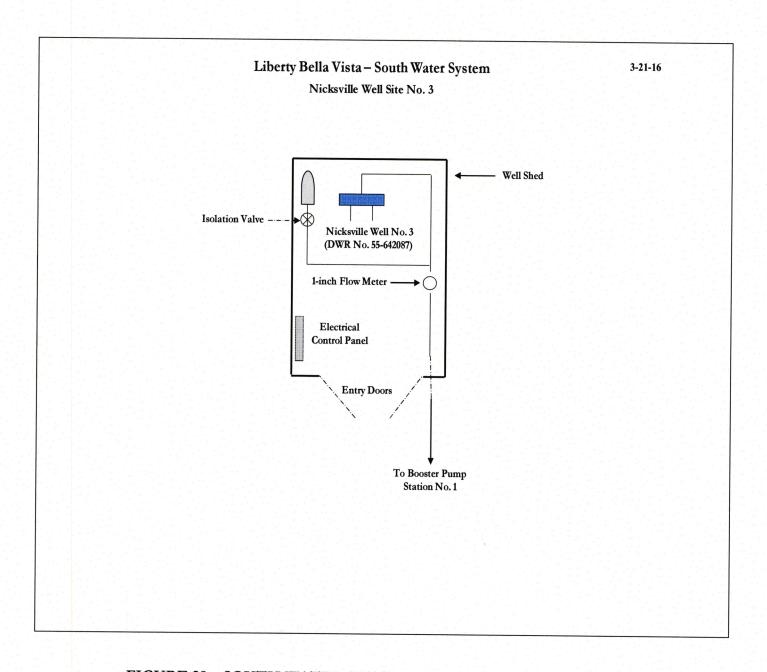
SOUTH WATER SYSTEM NICKSVILLE WELL SITE NO. 3
